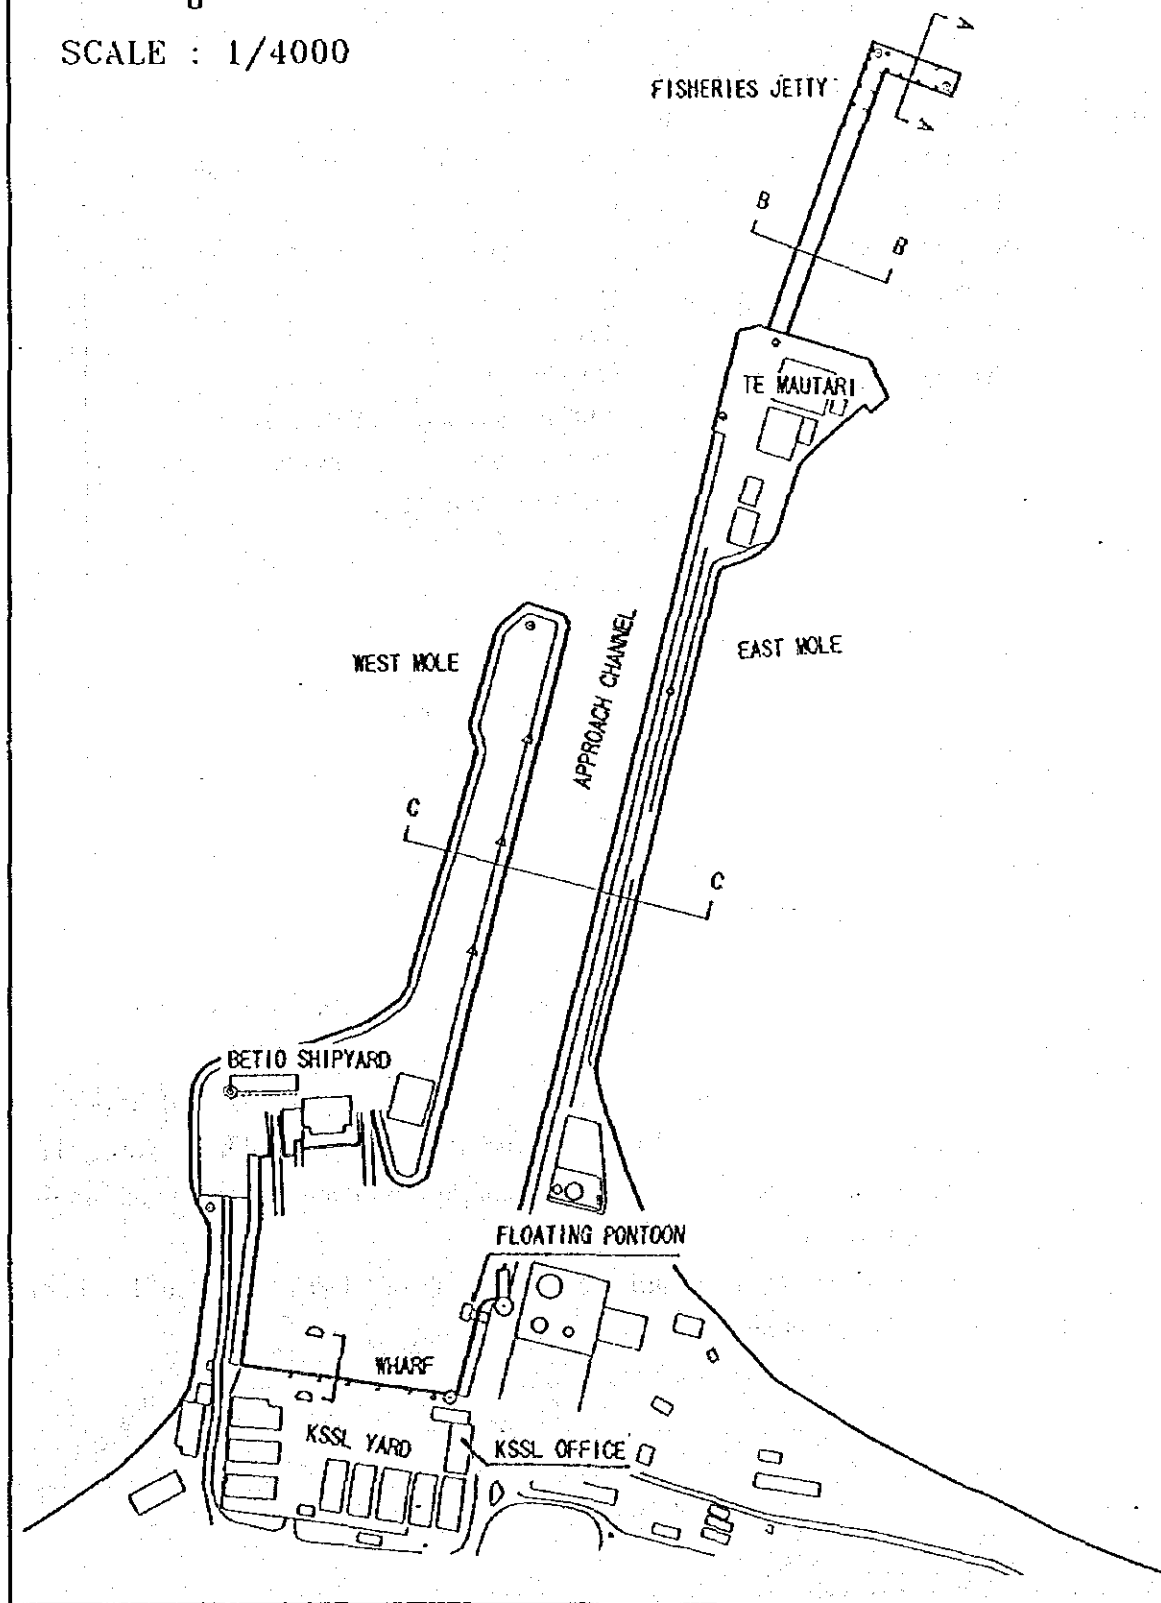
Outline of Existing Facilities in Beto Port
